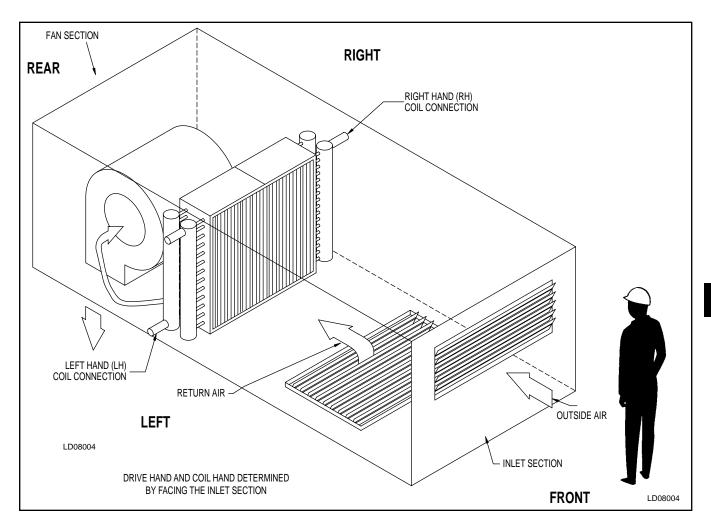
DETERMINING LEFT - OR RIGHT-HAND COIL CONNECTION / DRIVE SIDE
